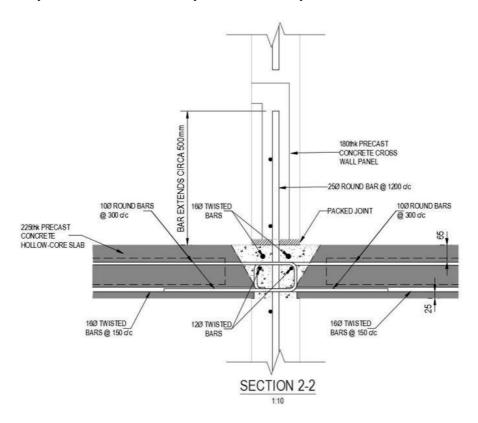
Example of insitu joint between Cross Walls and Floor Slabs
